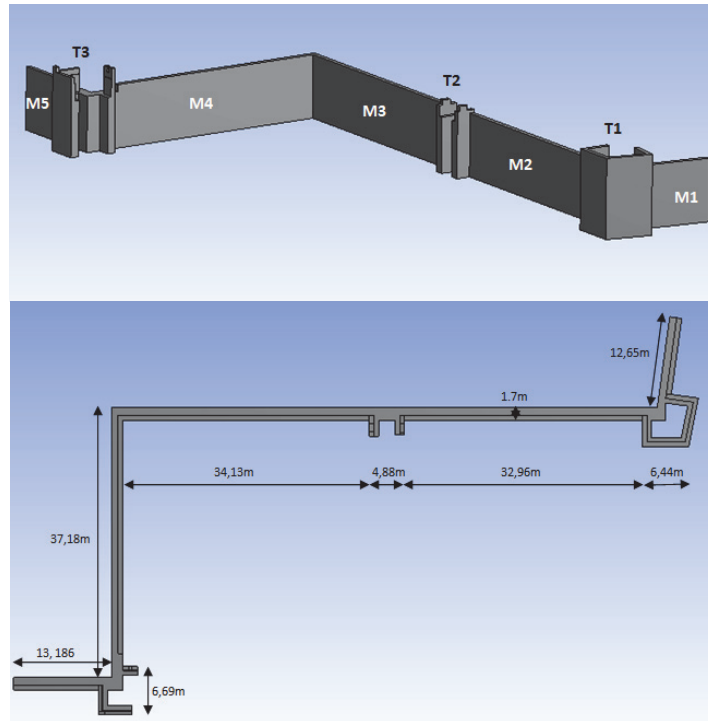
Geometry of Structure 04 (West corner walls, M1-M5, connected to three towers, T1-T3).
